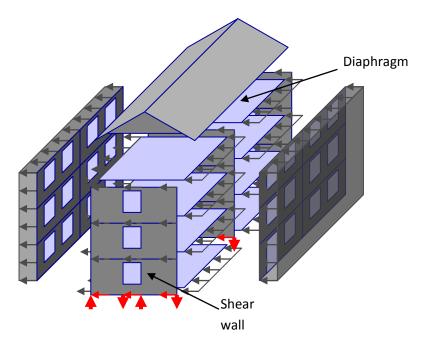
Force transfer in multi-storey timber frame building under lateral loading.
